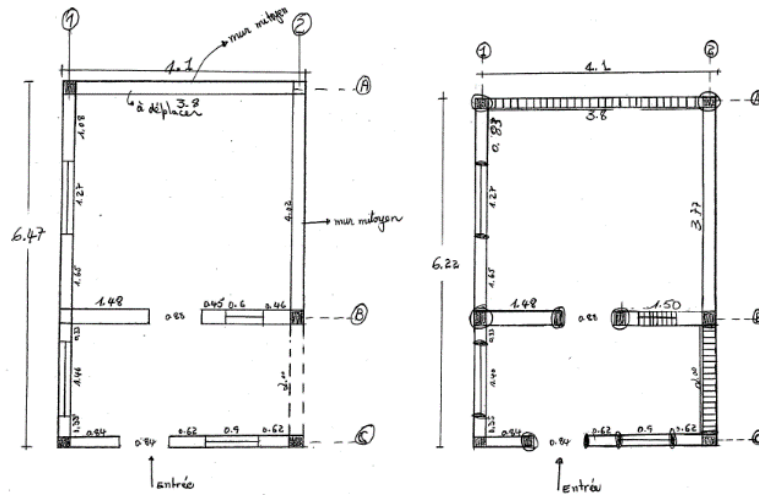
Existing (left) and retrofit (right) plans of an unreinforced masonry house retrofit to a confined masonry house (circled columns indicate new vertical ties and hatched walls indicate new walls)
